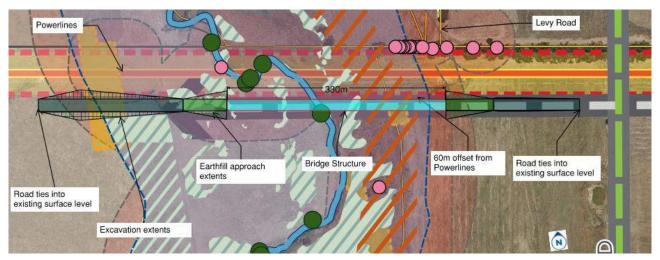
Option 2 – High Level Structure plan showing earthworks extents
